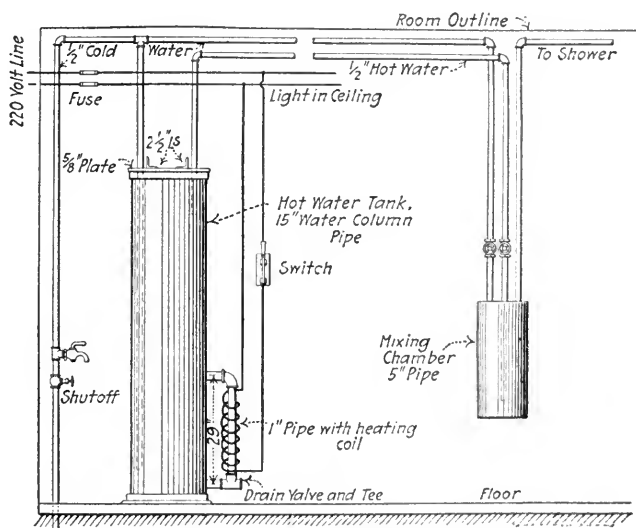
LAYOUT OF HOMEMADE SHOWER BATH.
